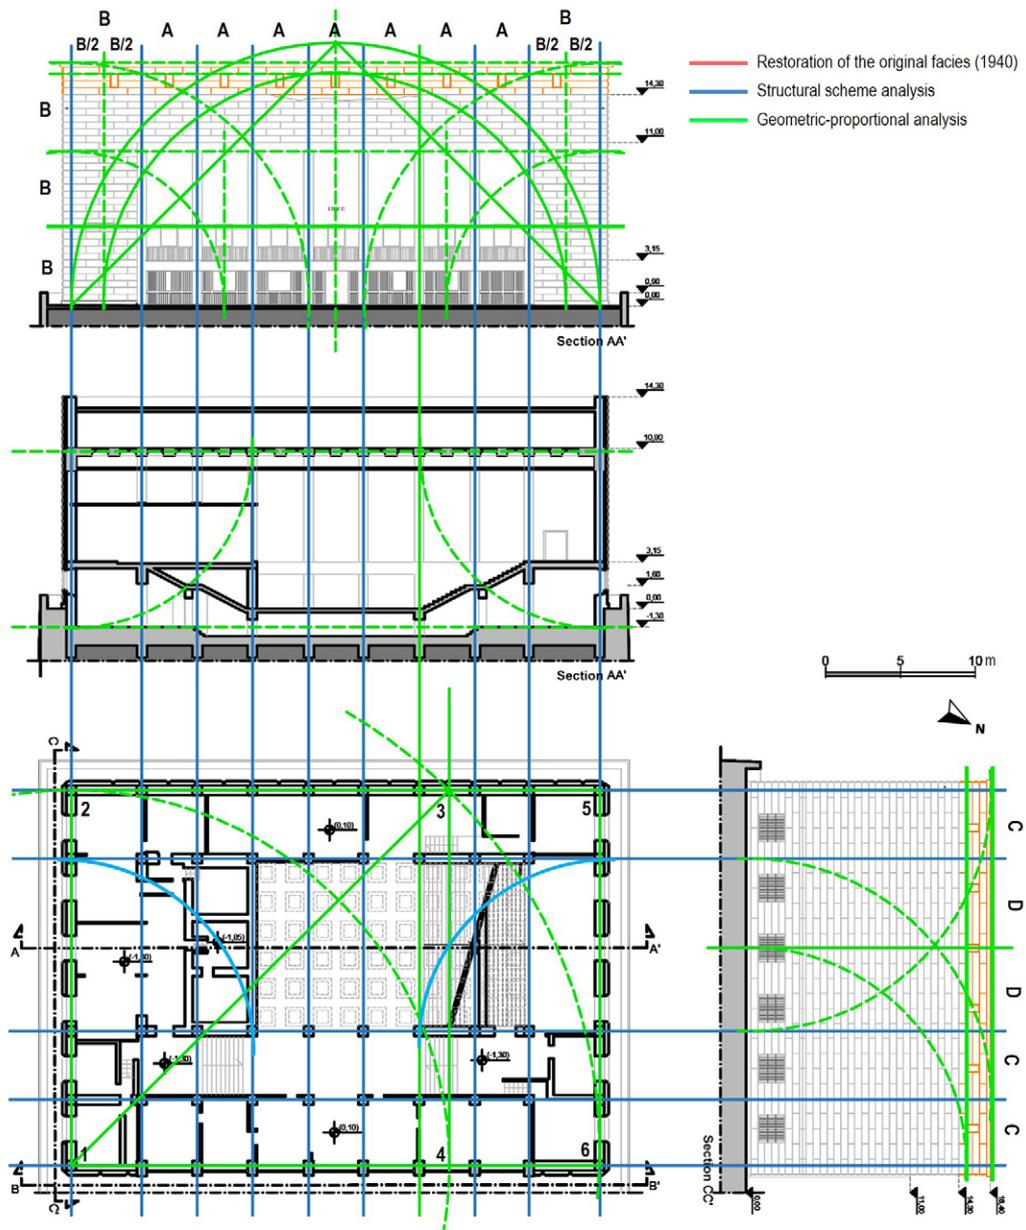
Geometric-proportional analysis in plan and elevations of the Albania pavilion, starting with its ex ante 1940 configuration, which included a summit crowning punctuated by small windows open in the ashlar.
